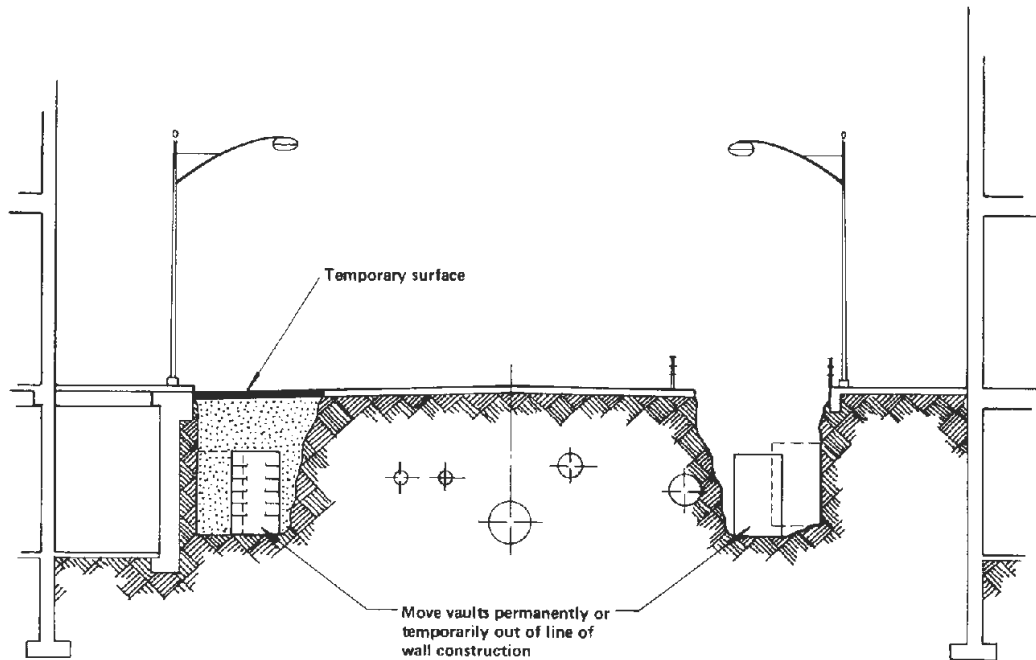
Step 2: The relocation of any utilities which must be permanently moved outside the excavation, should be completed prior to the next step. In some cases, manholes and vaults may need to be moved into the excavation to clear the new wall construction.
